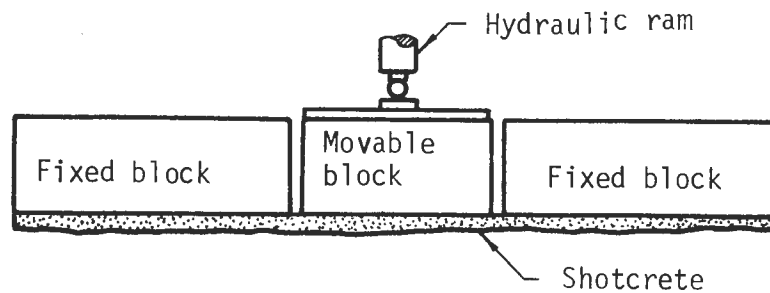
PLANAR GEOMETRY OF TEST DEVICE FOR STRUCTURAL TESTS ON SHOTCRETE LAYERS
